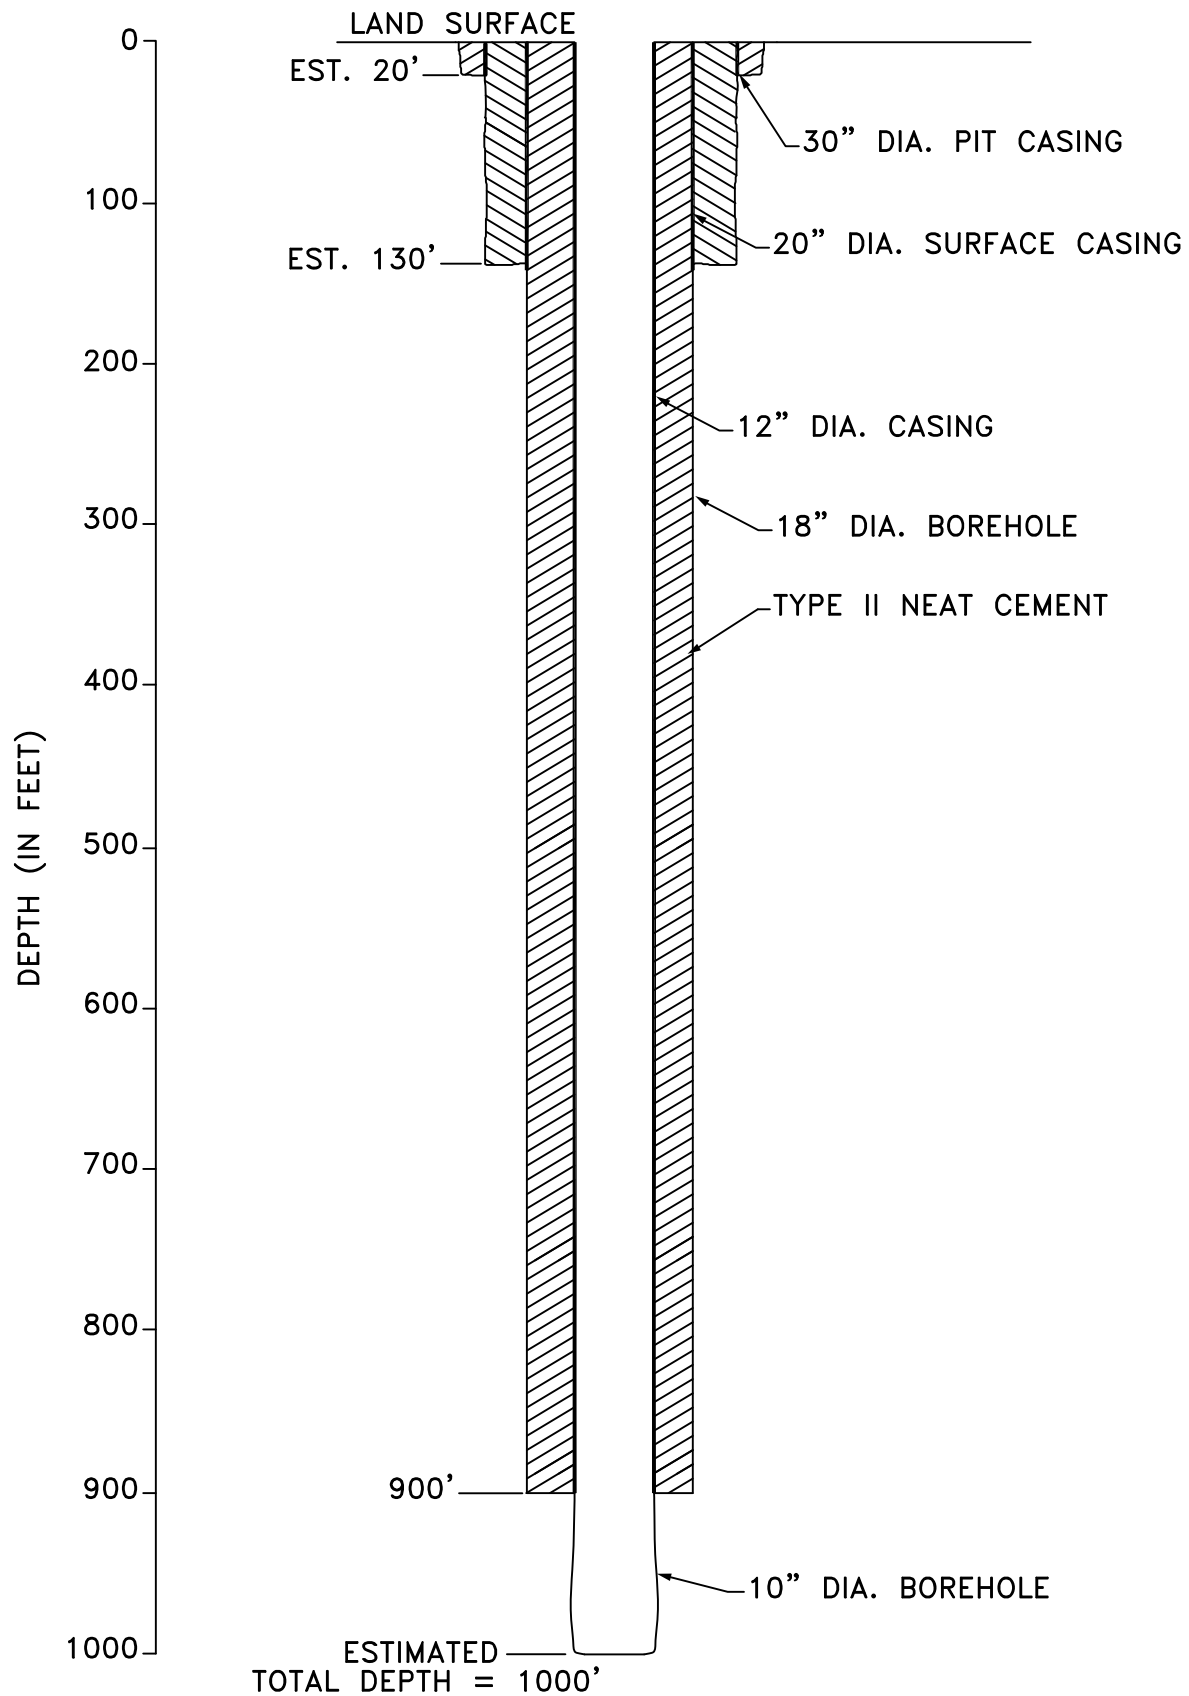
PROPOSED SECTION OF TYPICAL ASR WELL.
